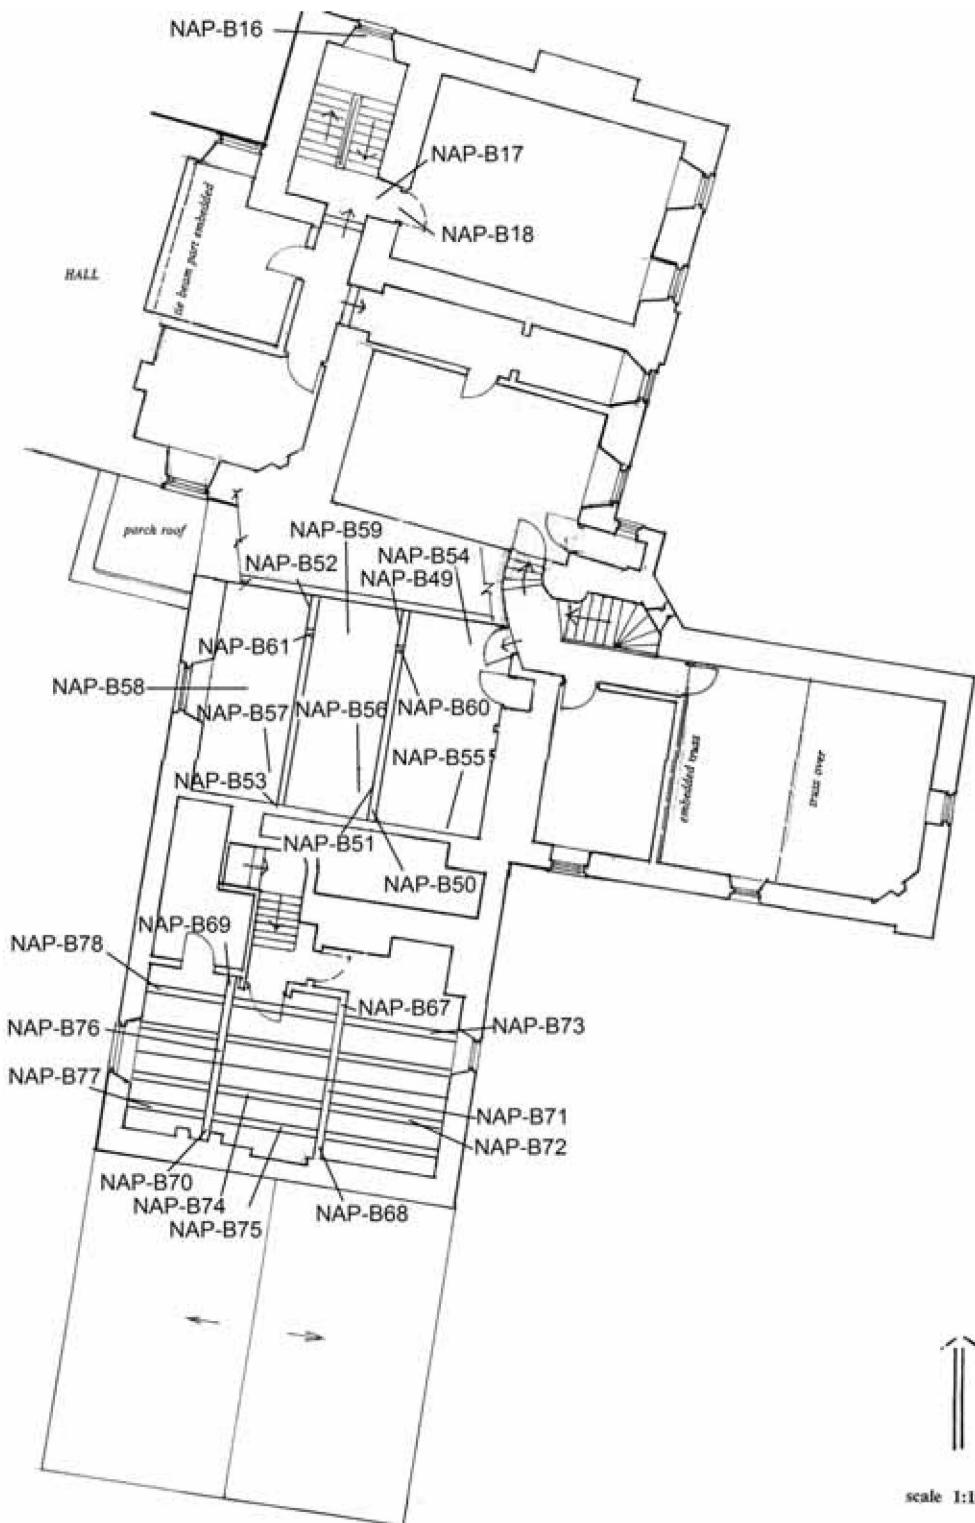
Low-end tower and service range, first-floor plan showing the location of samples NAP-B16–18, NAP-B49–61 and NAP-B67–78 (John Warren)
